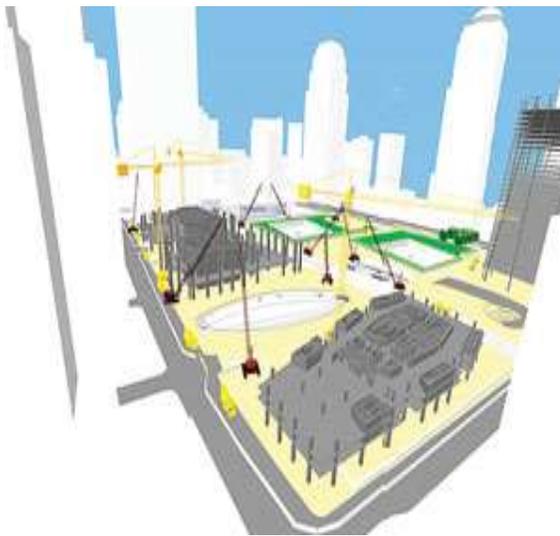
showing a site logistic planning model sourced from [newyork.construction.com](http://newyork.construction.com)
